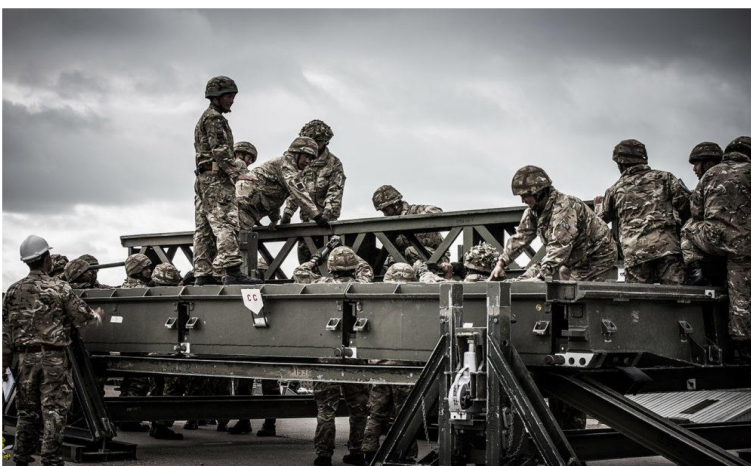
Image of the Queen's Gurkha Engineer troops creating a bridge. Latter ("Queen's Gurkha Engineers", 2014).
